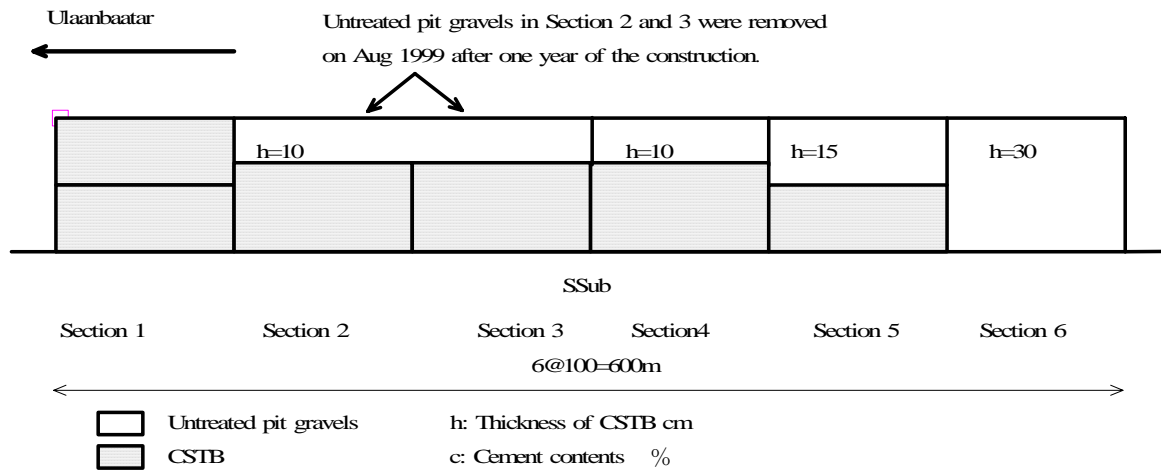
Plan view and road structures in Nogoon Dov Test Road
